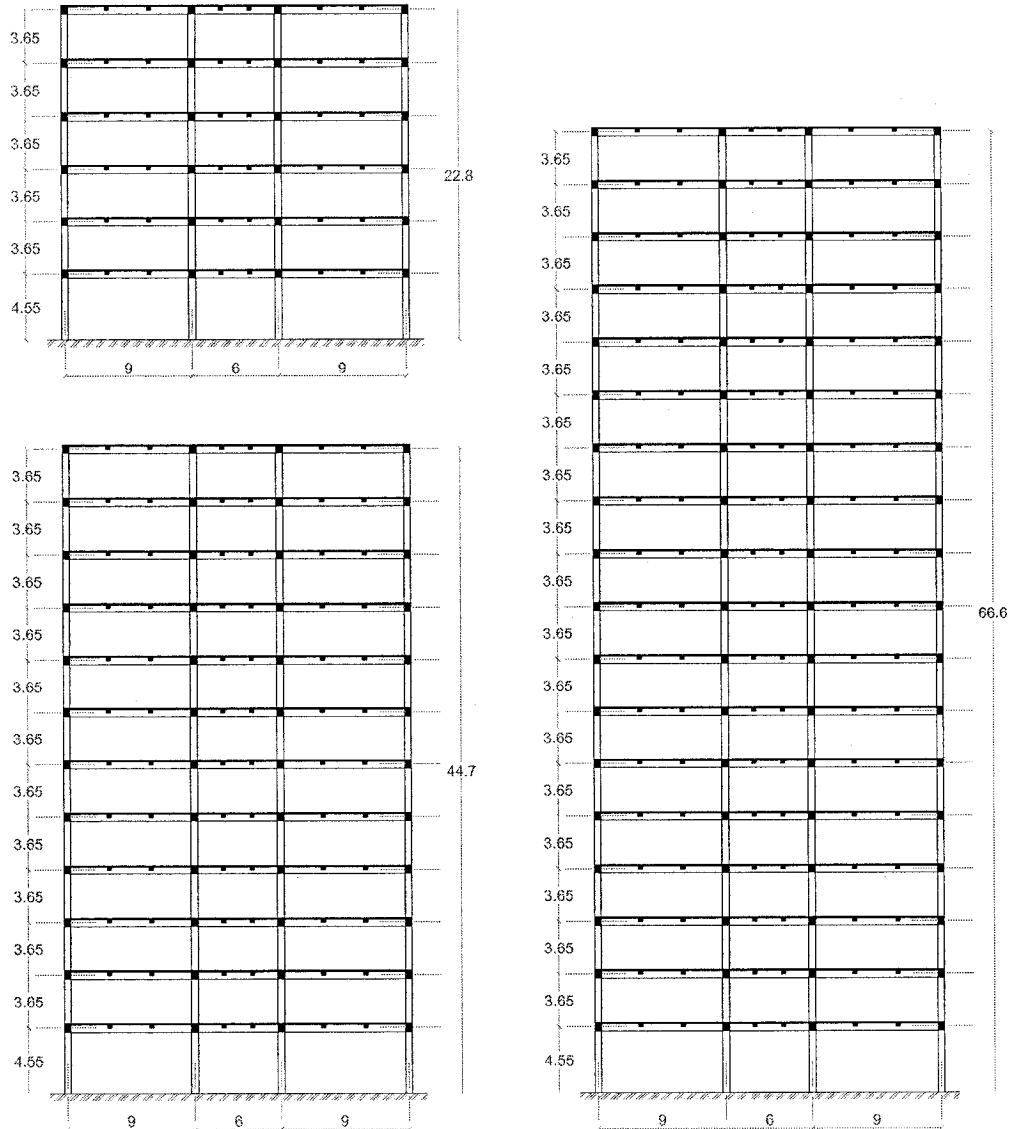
Elevation of the 6, 12 and 18 Storey CMRFs (Dimensions are in Meters)
